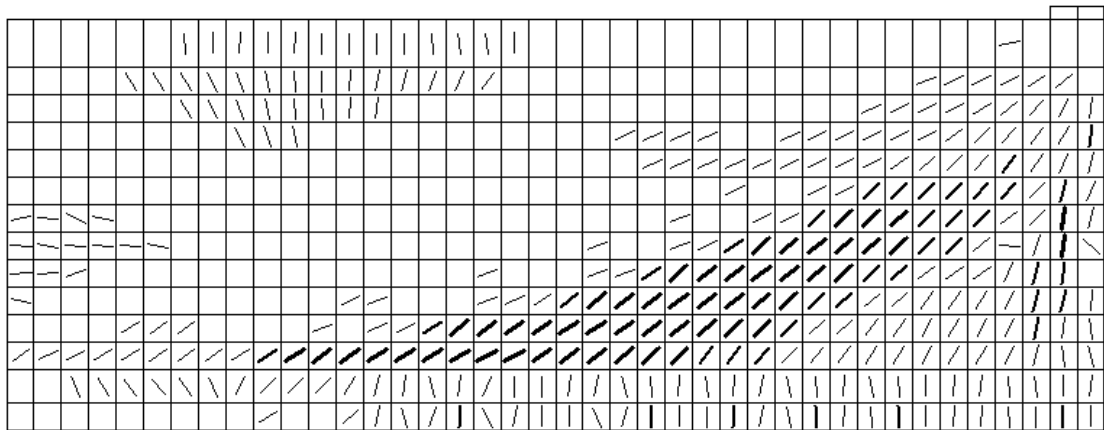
Crack Pattern of Beam S3-1 at Failure
